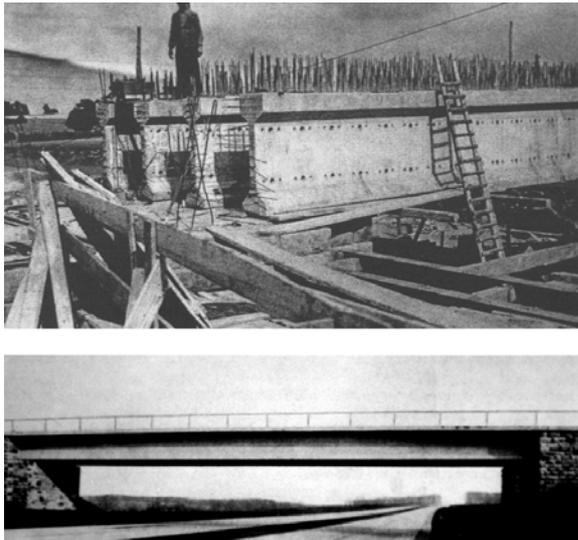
The Ölde Bridge comprised of four 33 m long prestressed concrete I-beams and a reinforced deck, Wayss & Freytag, 1938. (a) Under construction. (b) The finished bridge. (Grote and Marrey)
